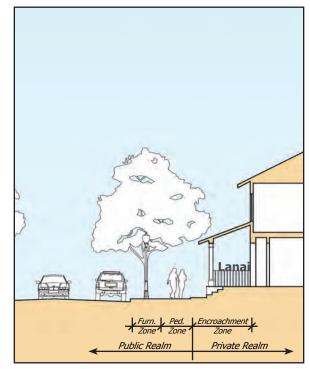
Cross Section, Lanai and Yard Frontage (Illustrative)
